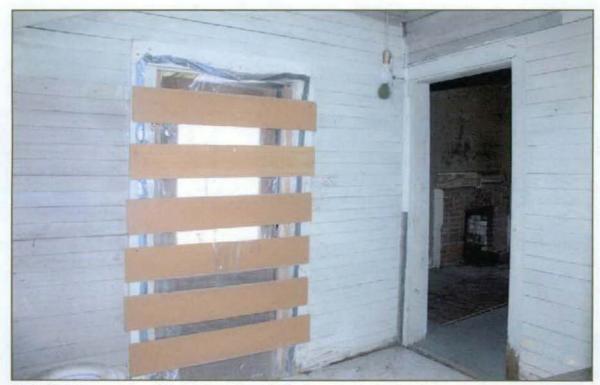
House, View #46, Interior, Room #105, Camera Facing Northeast
